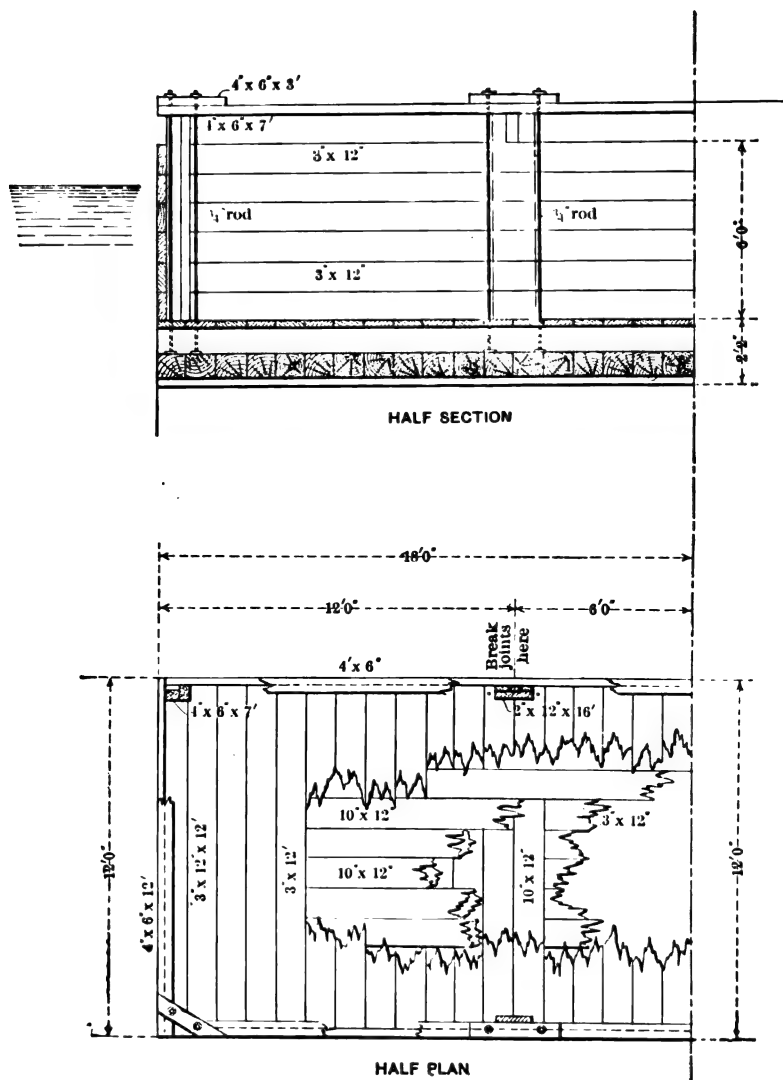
COPPER-DAM ON GRILLAGE, PAYETTE AND WEISER RIVER BRIDGES, UNION PACIFIC SYSTEM.
